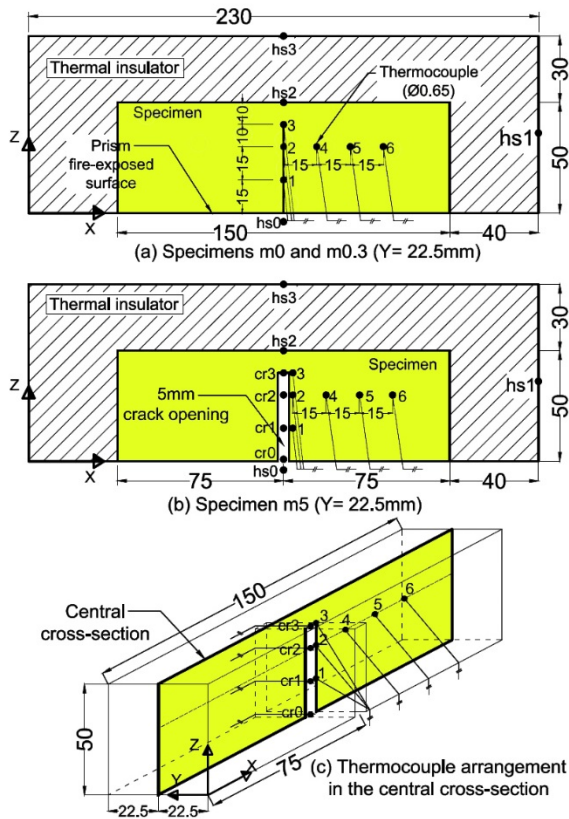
Dimensions and details of specimens (mm): hs0 and cr0 are located at the crack-opening face, z=0mm and z=2mm, respectively.
